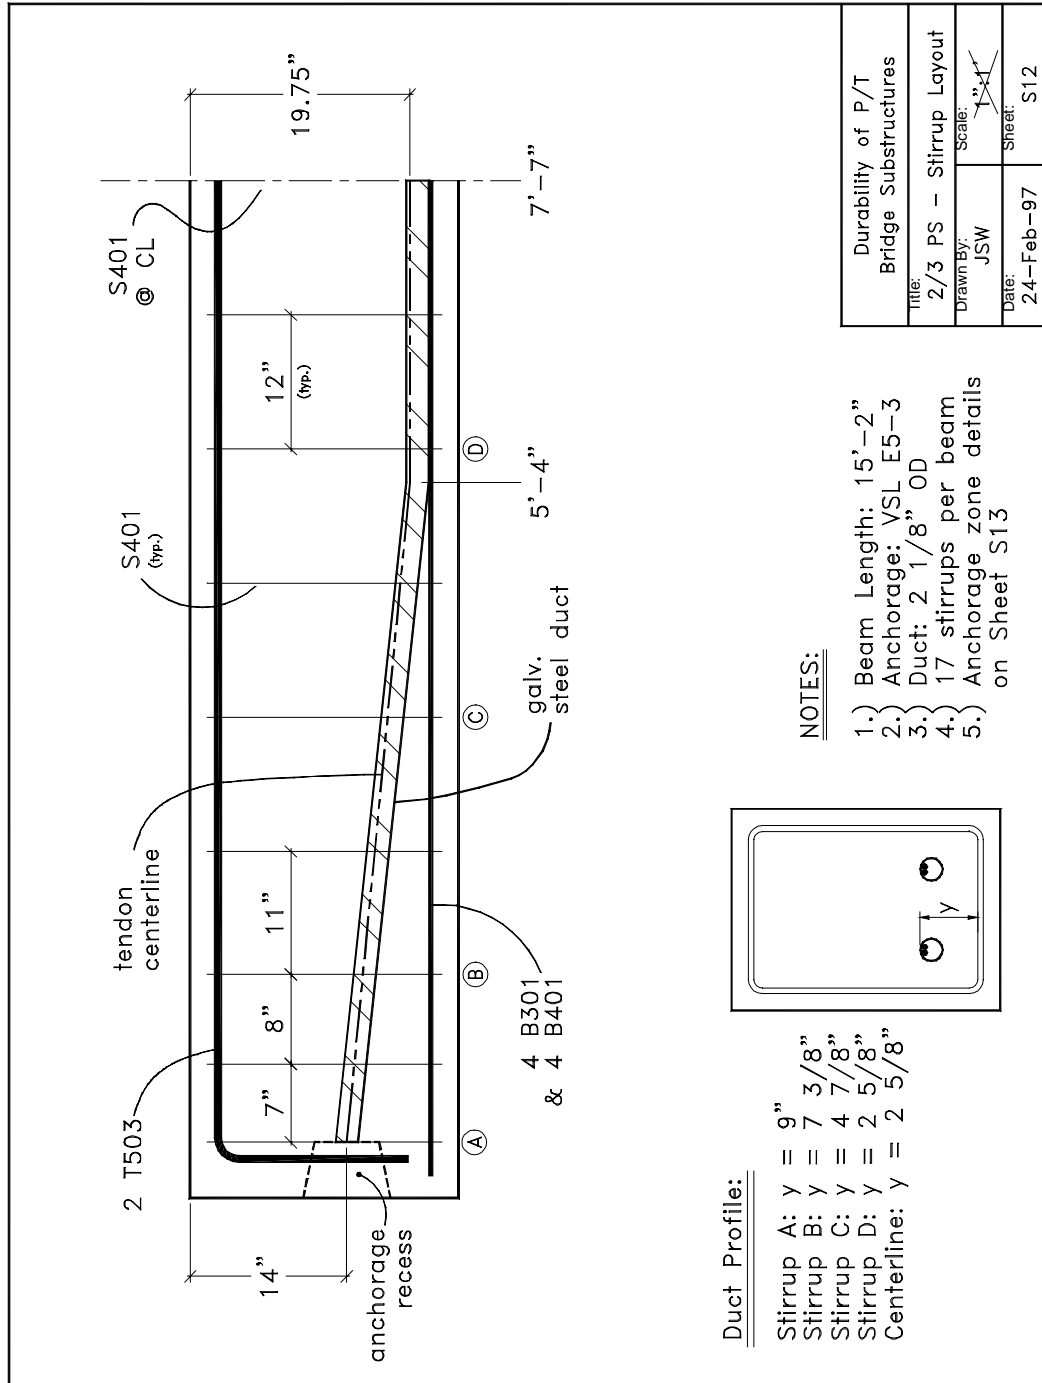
Sheet S12: 2/3 PS Stirrup Layout
